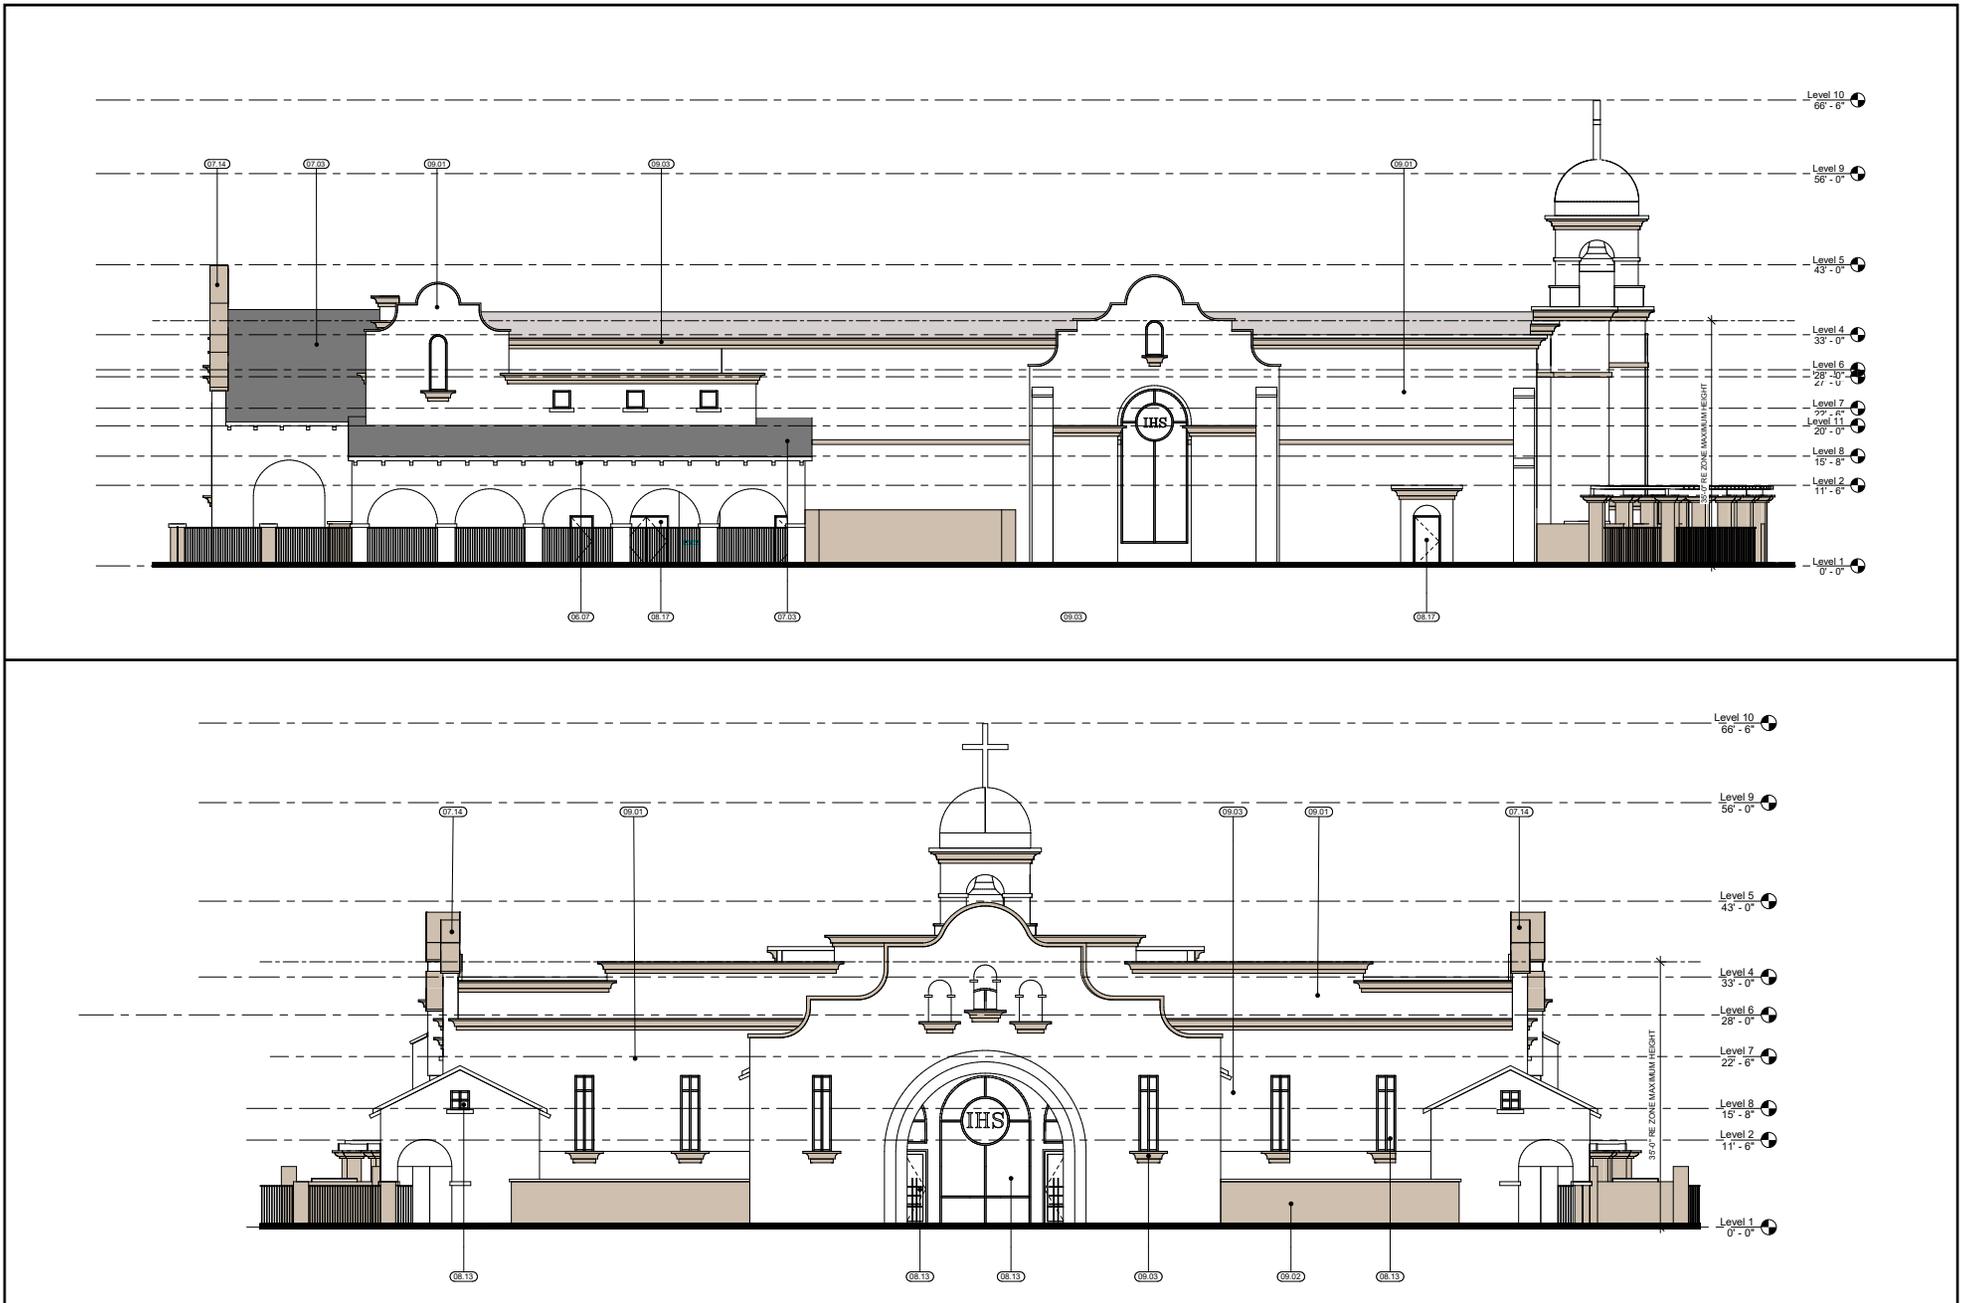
Elevations (Sanctuary Building 1)
